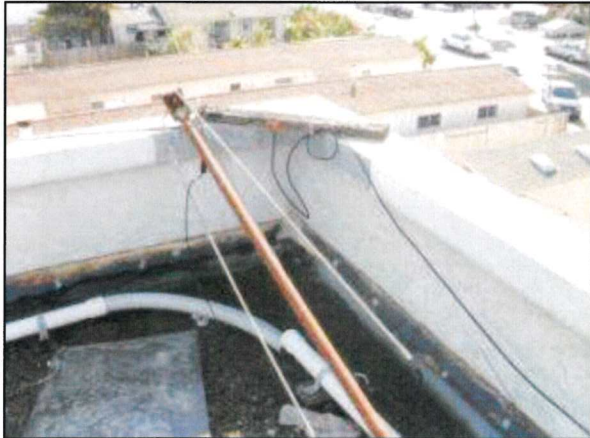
Fire Station #1 Caulk repairs are needed at the termination flashing on the roof.
